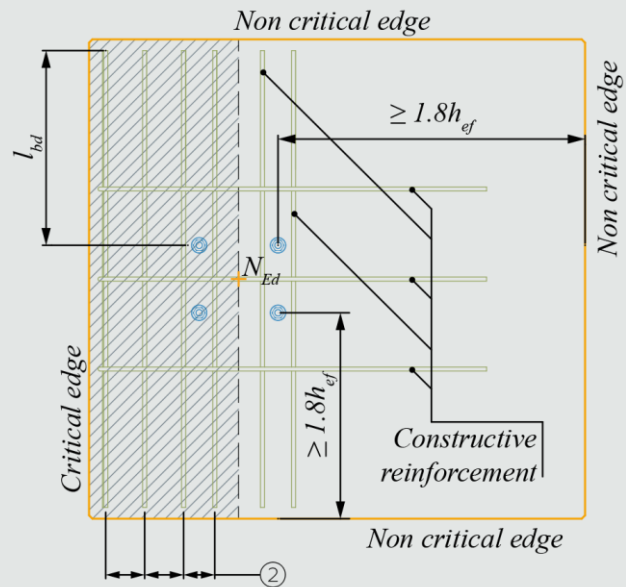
Detail for splitting reinforcement. Example case with one critical edge.
